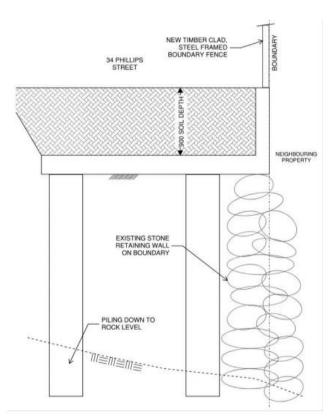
Section detailing retaining wall and stone retaining wall of neighbouring property (Partridge Structural Pty Ltd)
